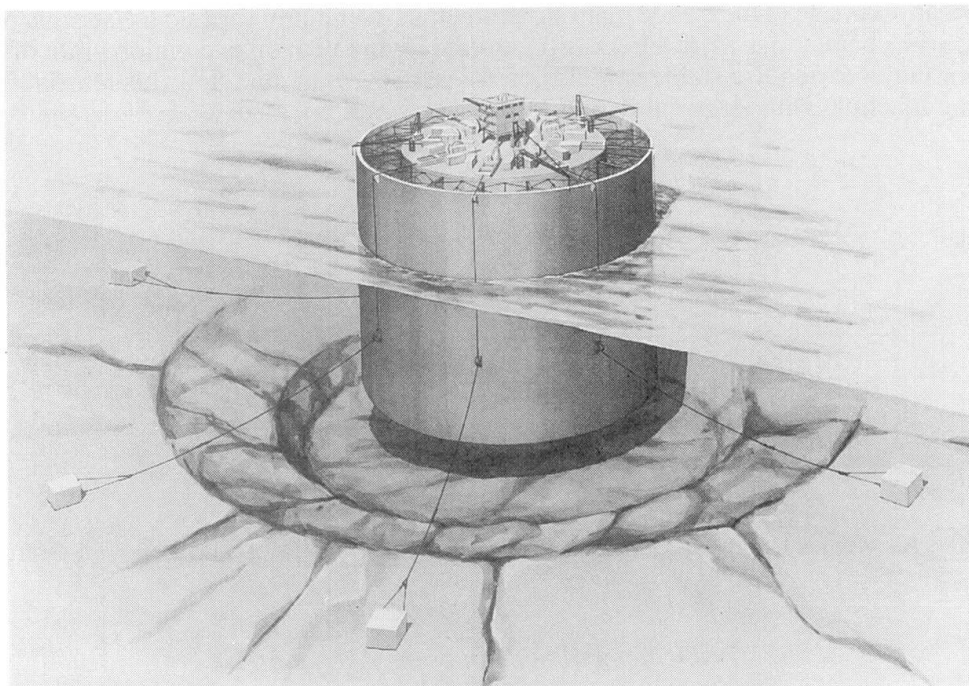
Installation of Prefabricated Steel Caisson on Excavated Seabed
